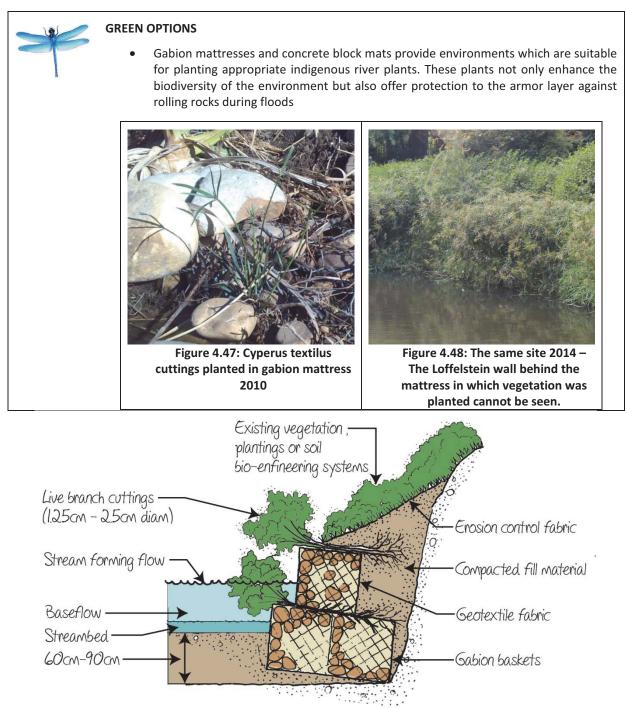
Typical cross section for gabion retaining wall with shrubs planted through it – this type of detail is seldom used in South Africa
